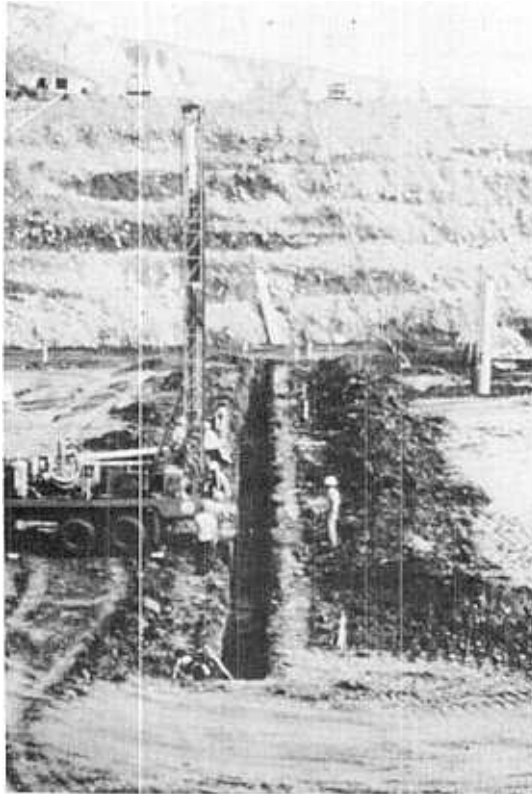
Trench excavation in embankment for installation of piezometer instrumentation. P801-D-81007.
